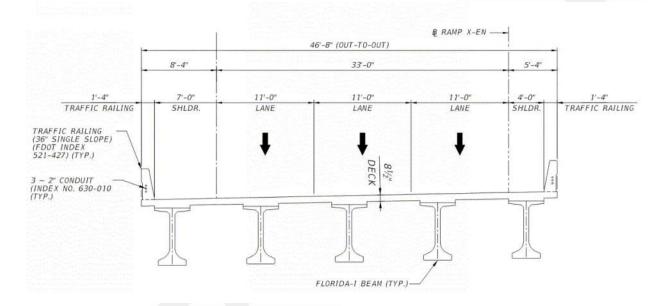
Bridge Typical Section (Bridge No. 7)
